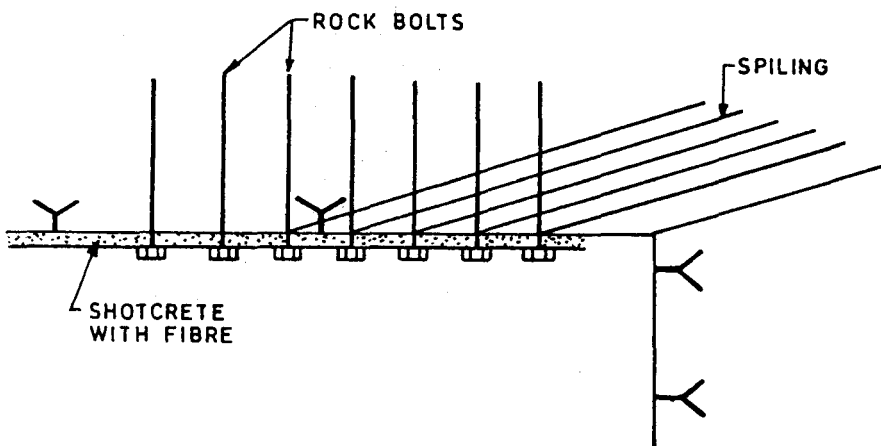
ARRANGEMENT OF SPILING DOWEL WITH THE ADVANCEMENT OF TUNNEL FACE
